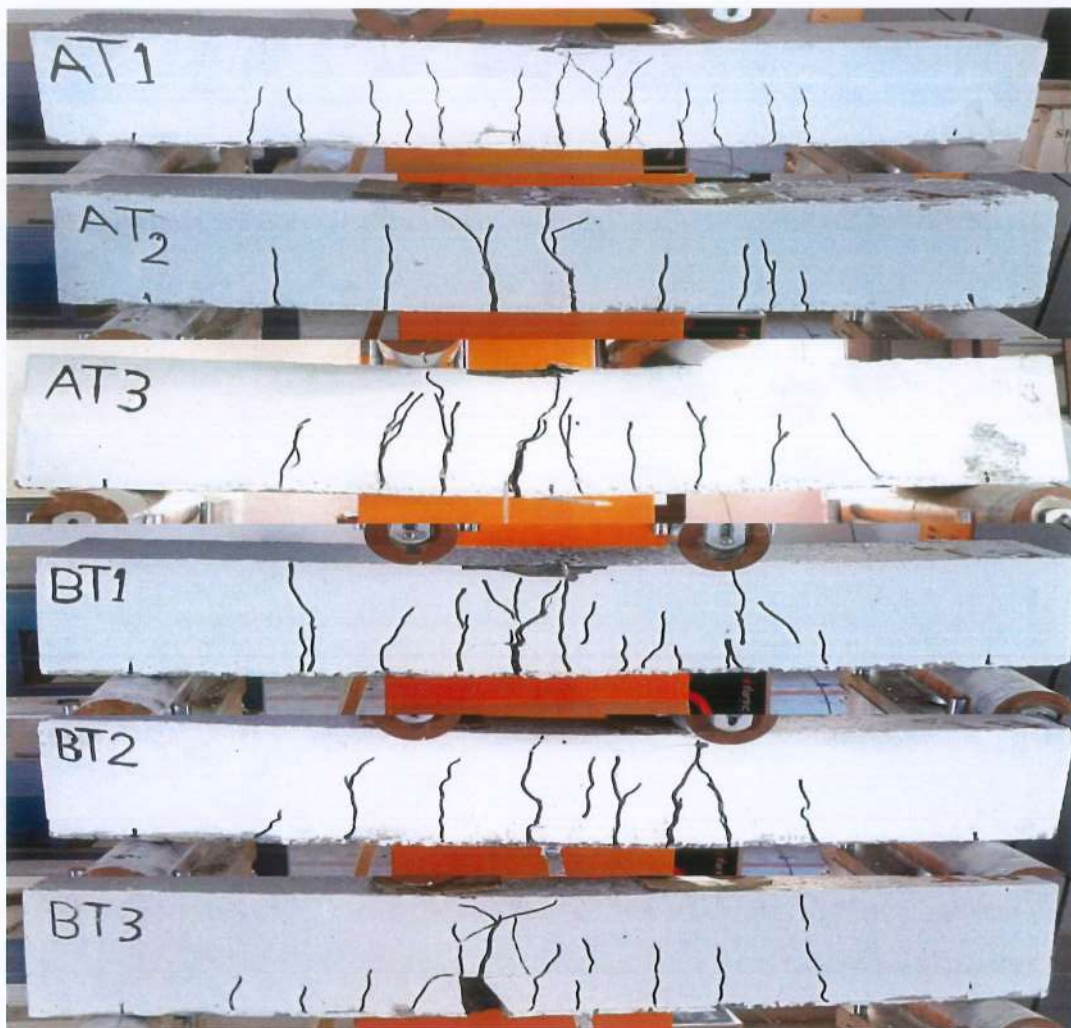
Crack Pattern of Beams with Truss-Shear Connector
